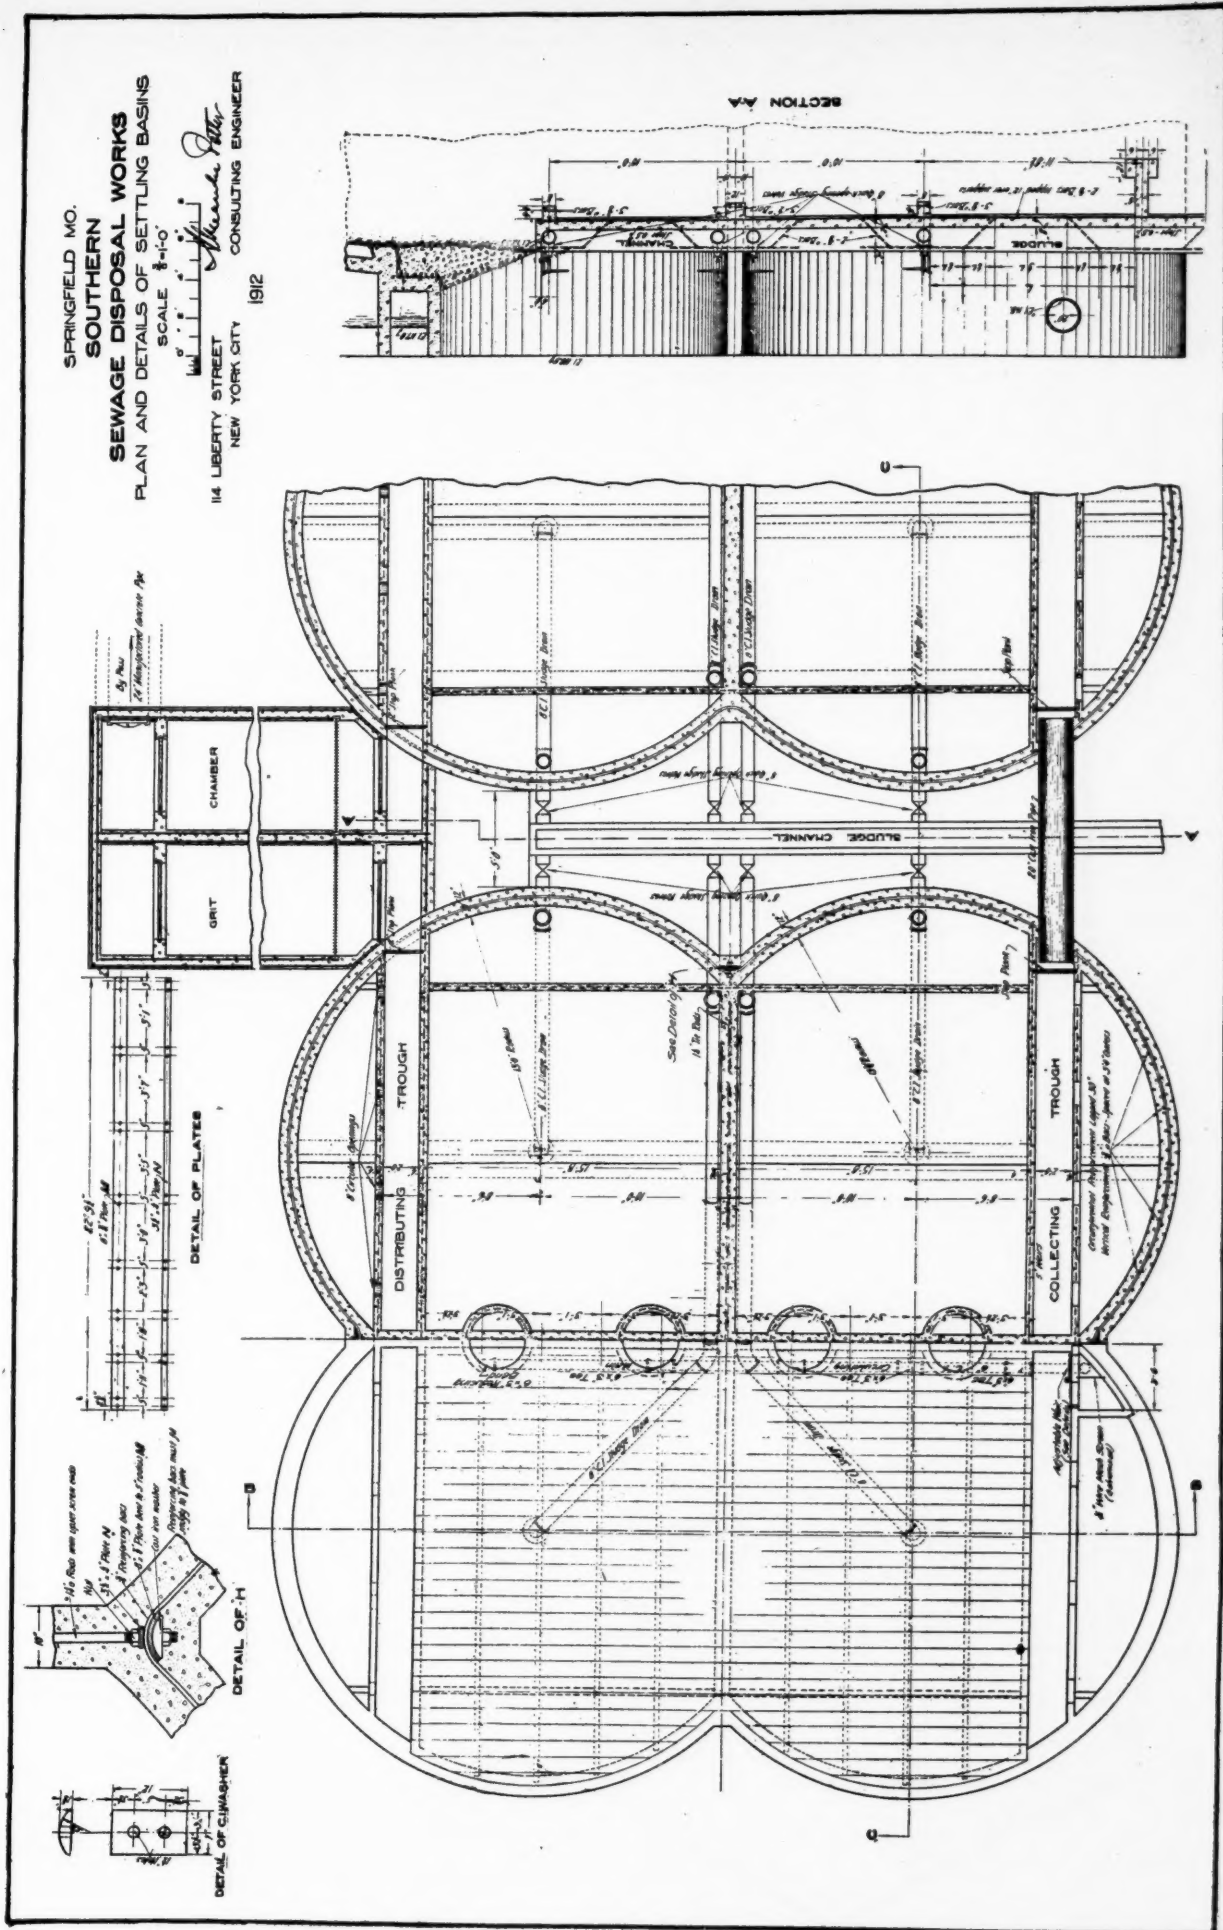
PLAN AND DETAILS OF SETTLING BASINS.
